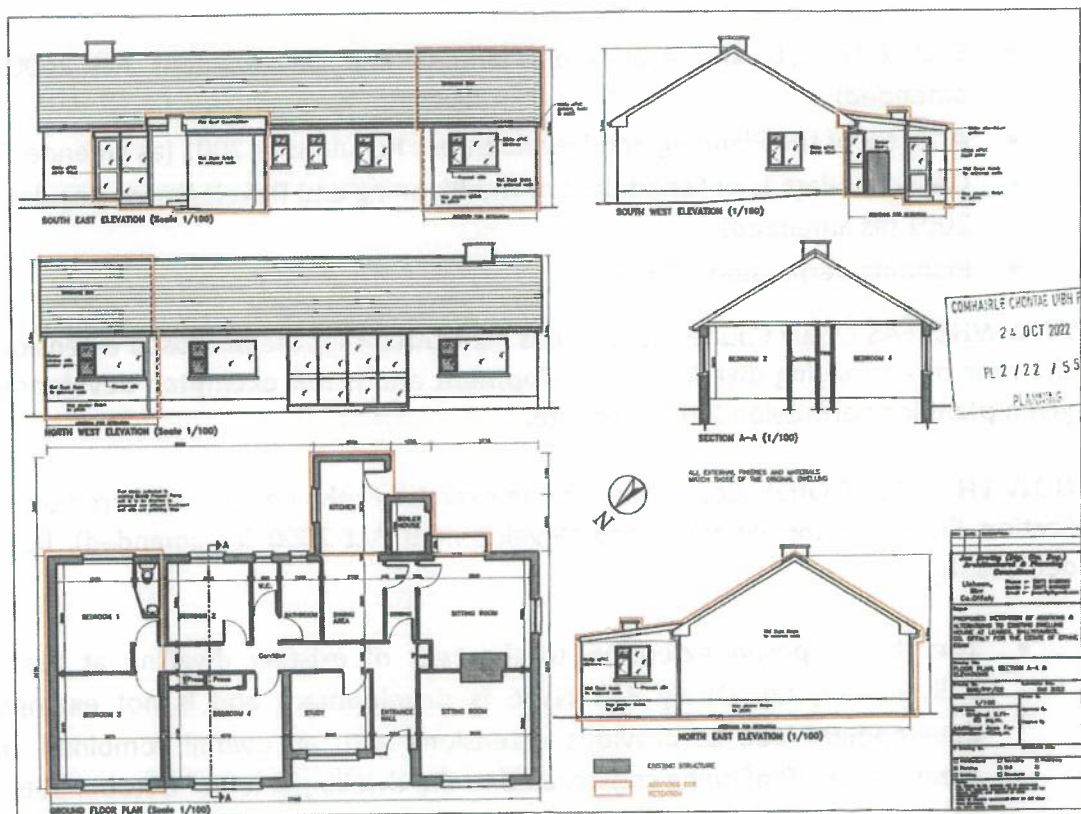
Previous extensions which were granted retention permission under planning reference 22/550
